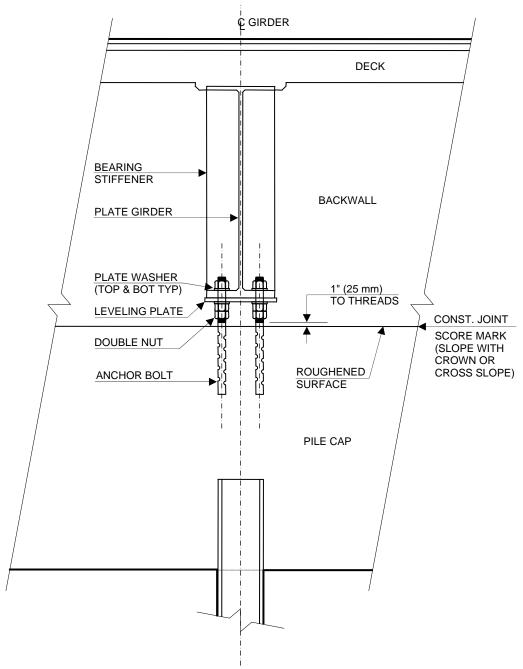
Bearing Assembly Cross Section (Steel Girder)
